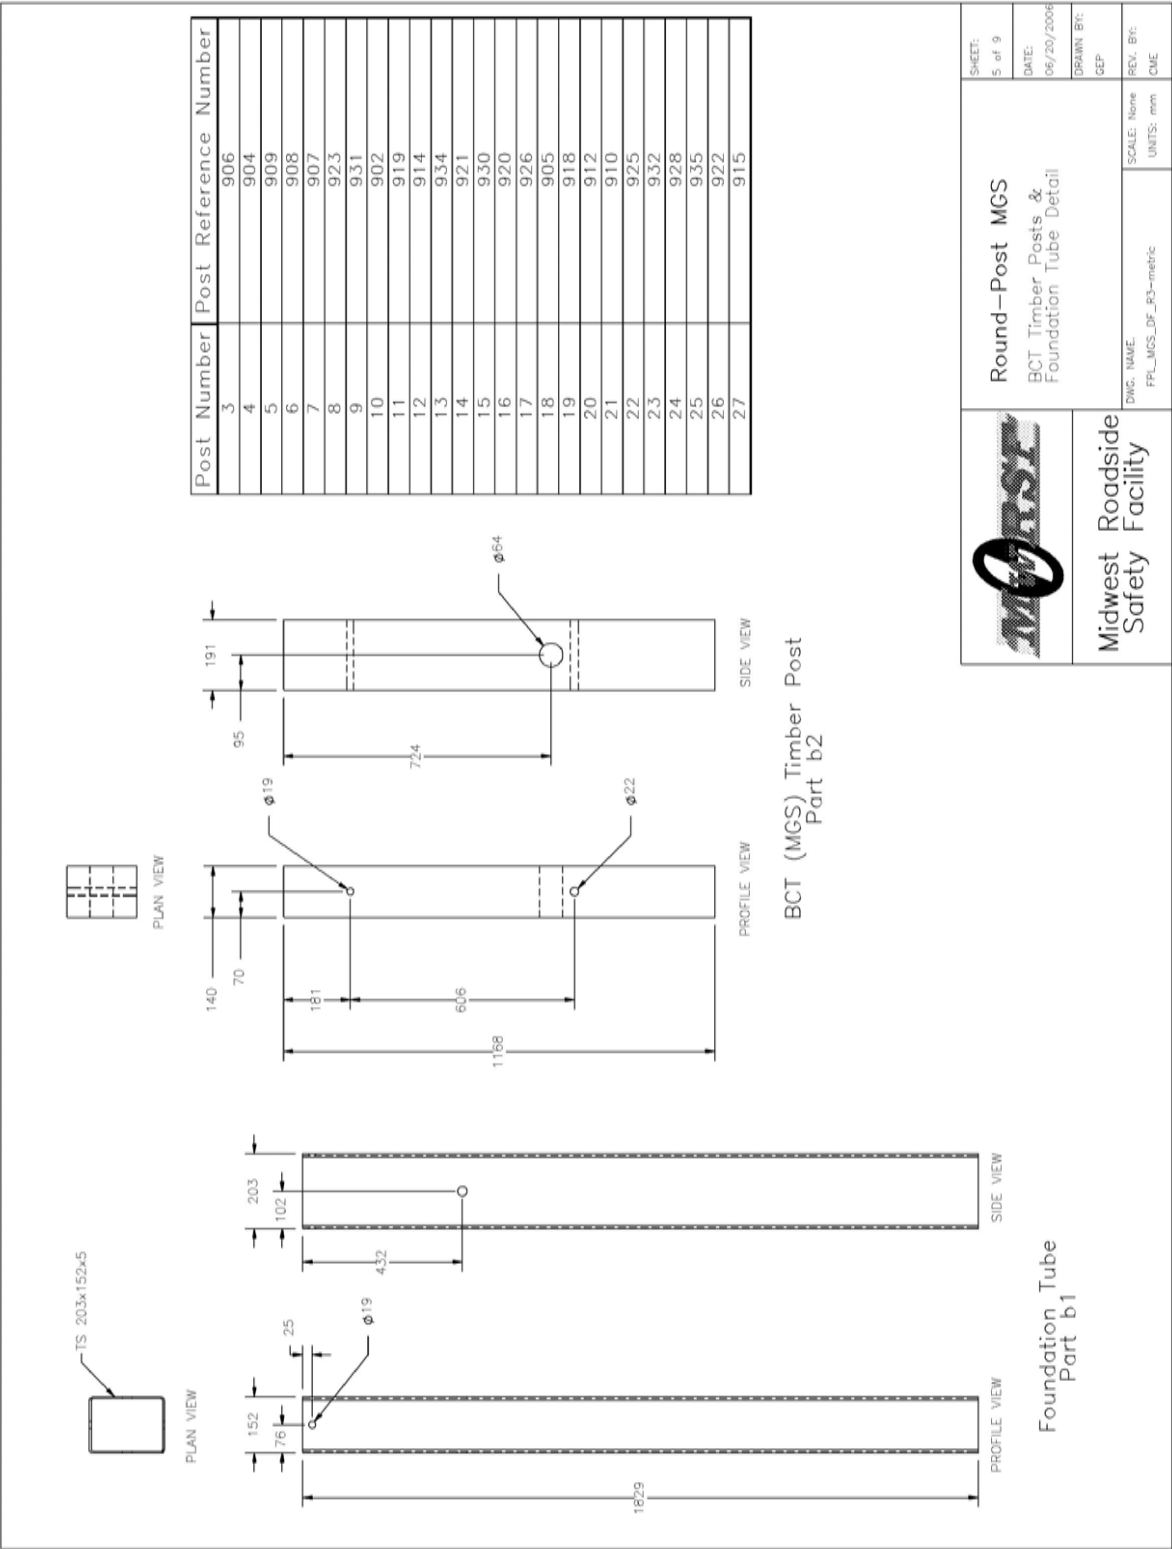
MGS Round Post Douglas Fir Details – Anchor Post Detail
